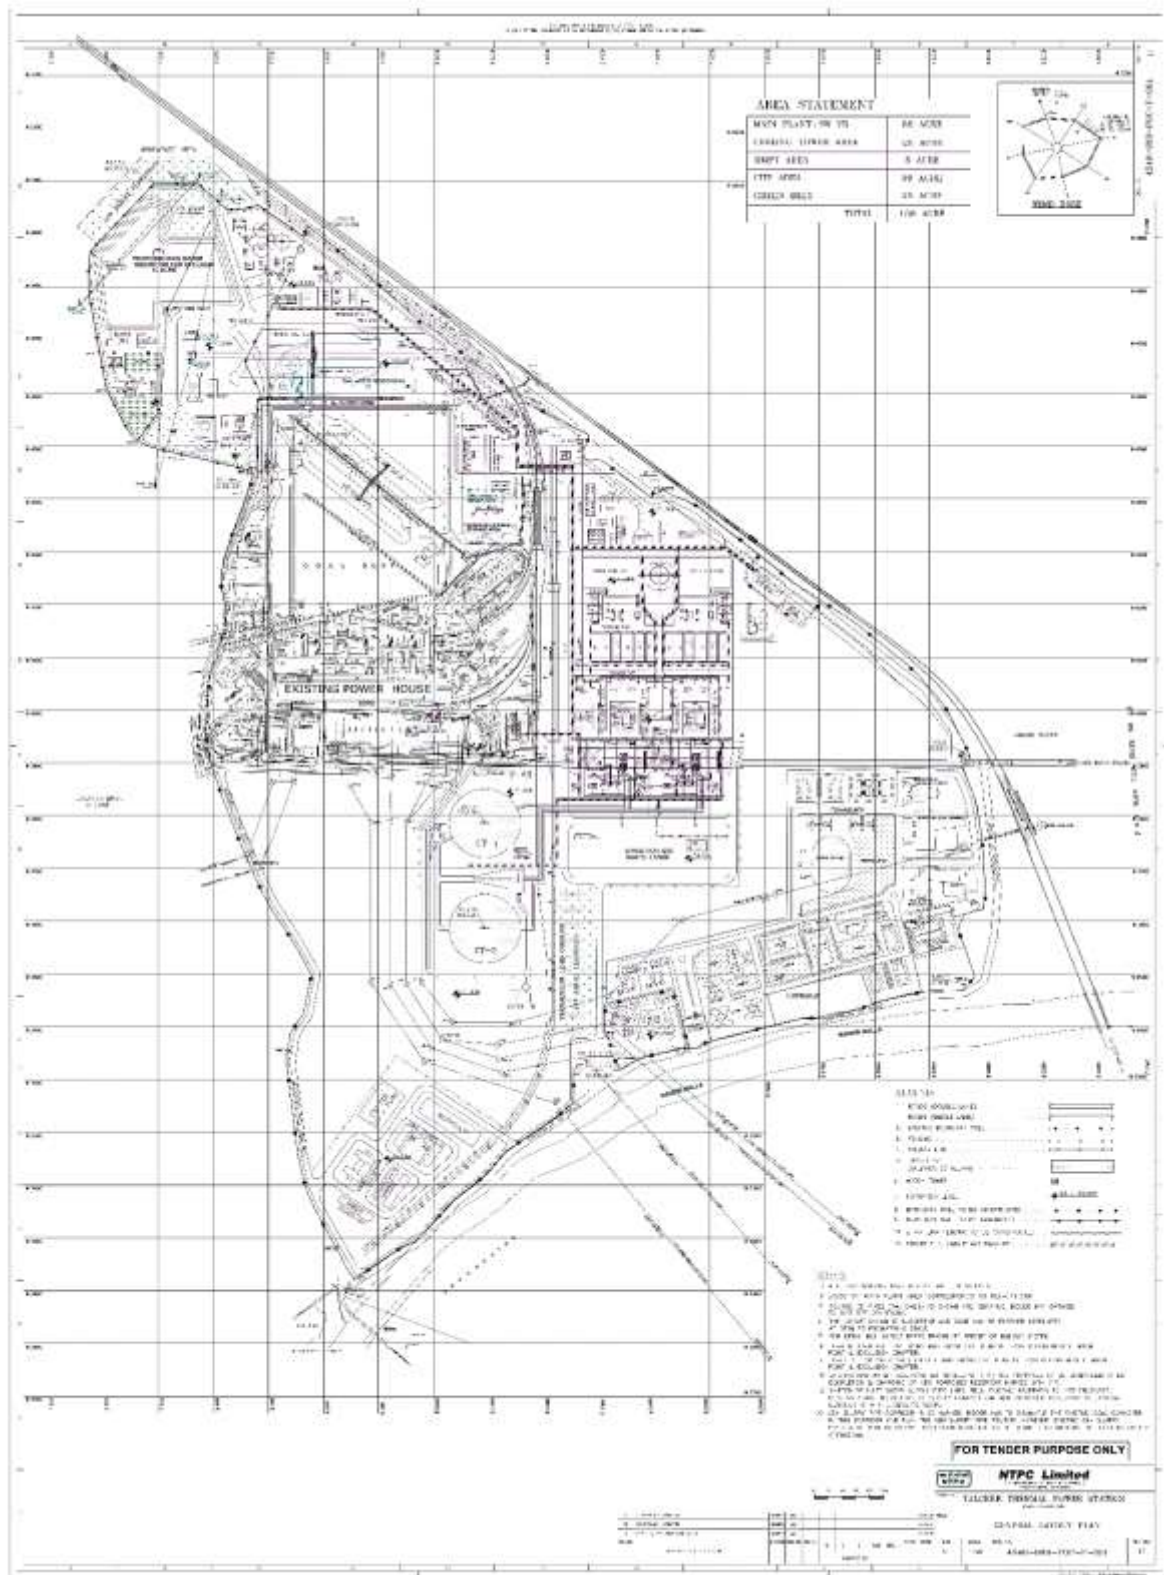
Various facilities (components) in the TTPP stage III and existing plant
